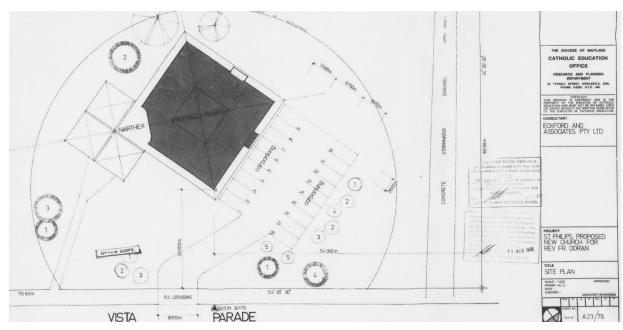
Extract of Approved Site Plan (Building Application No.1326/76)
